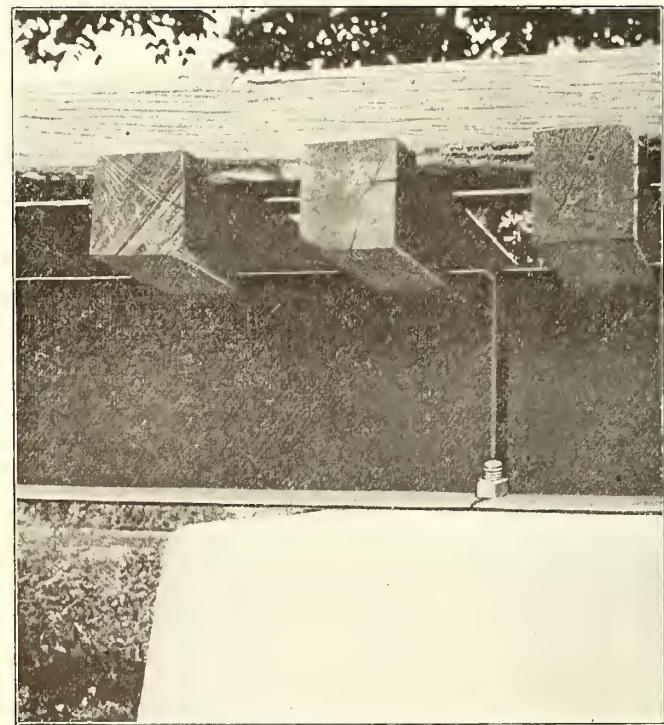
Boyertown & Pottstown Railway—View at one of the Lowland Bridge Piers, Showing Dapping of Ties
